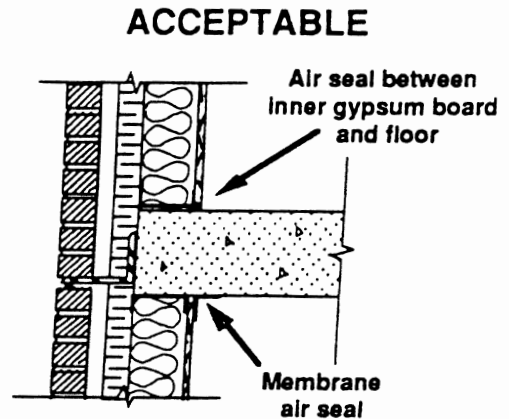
Accessible Drywall Air Barrier (Perreault 1989)
